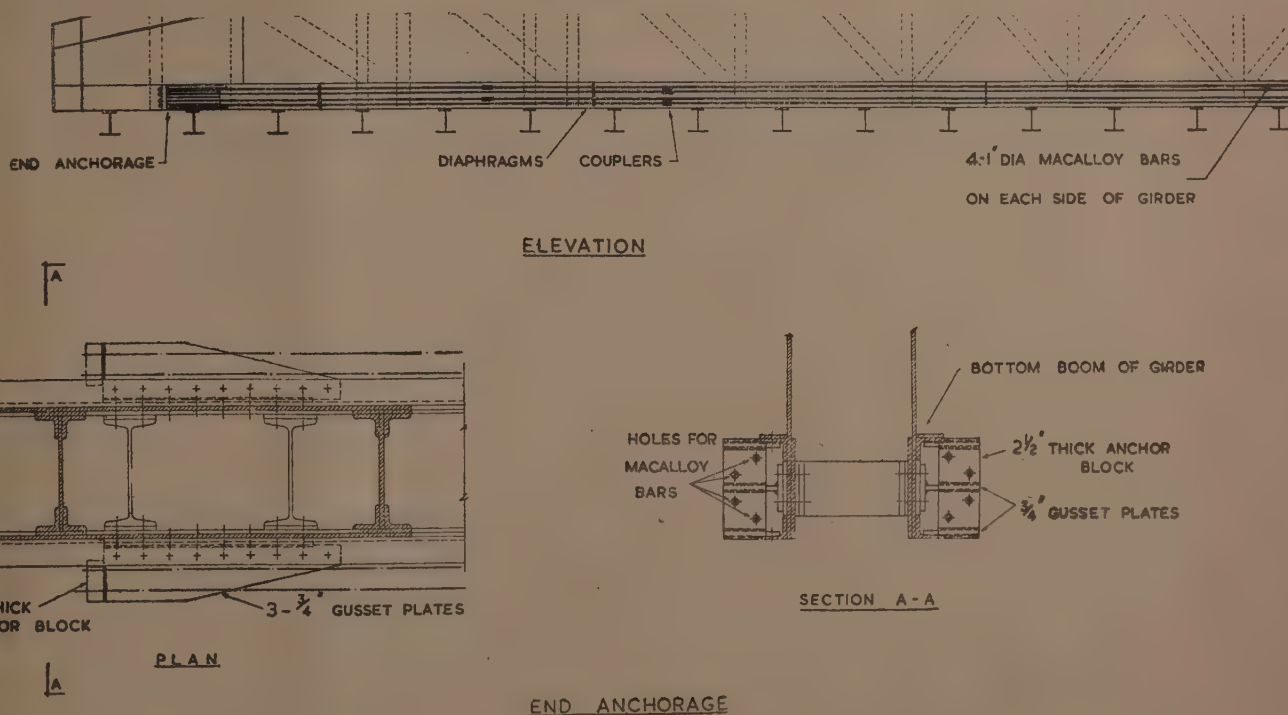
Method of strengthening tension boom of 160 ft. span lattice girder by British Railways, Western Region
